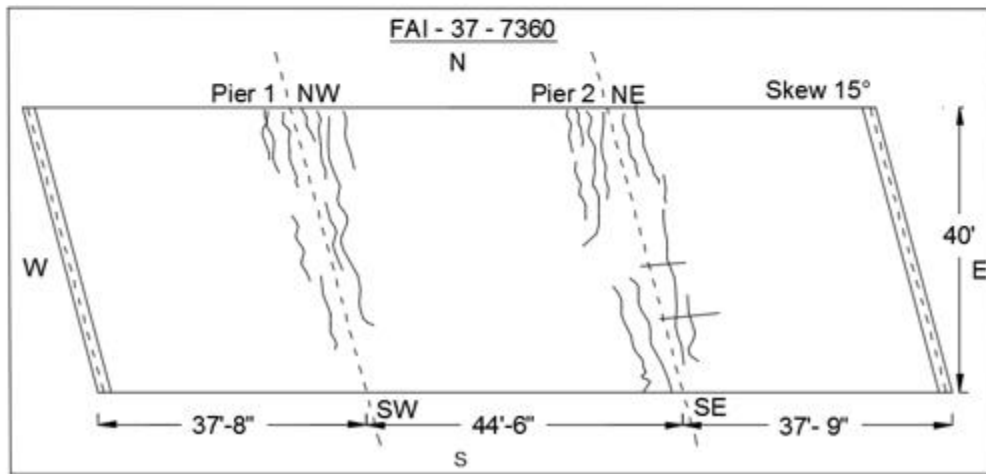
Bridge Inspection Pictures and Crack Map –FAI-37-7360
